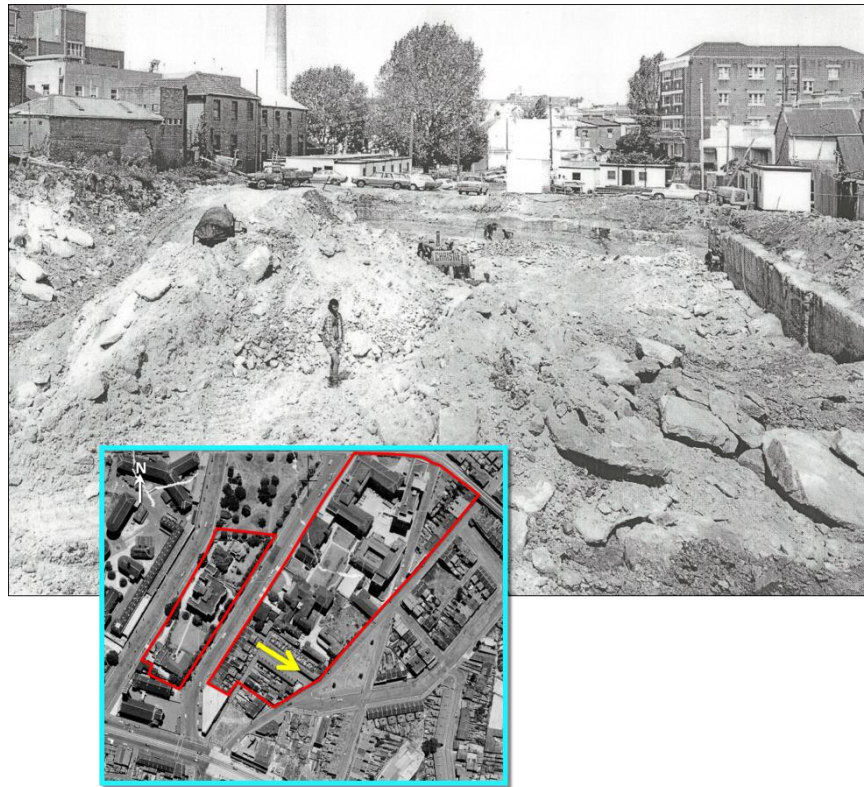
1983 - demolition of 1913 Xavier Nurses' Home building (inset shows location of photograph) (St Vincent's Hospital Archives).
